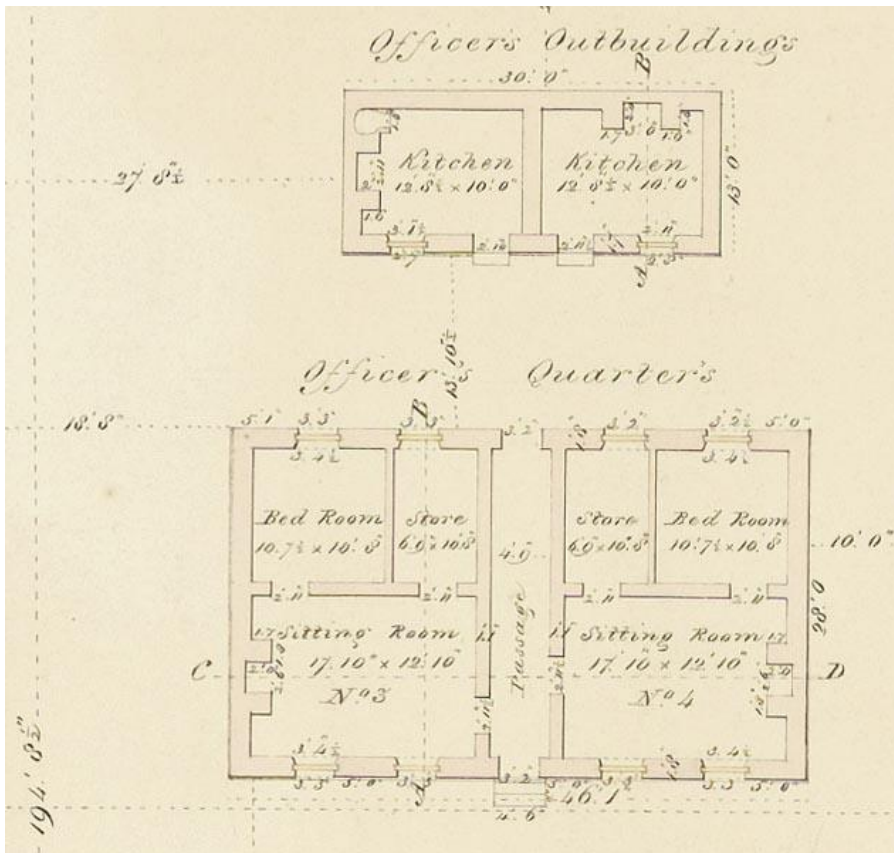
Detail of floor plan of officers' quarters Norfolk Island Military Barracks (Source: Tasmanian Archives PWD266-1-1885)
